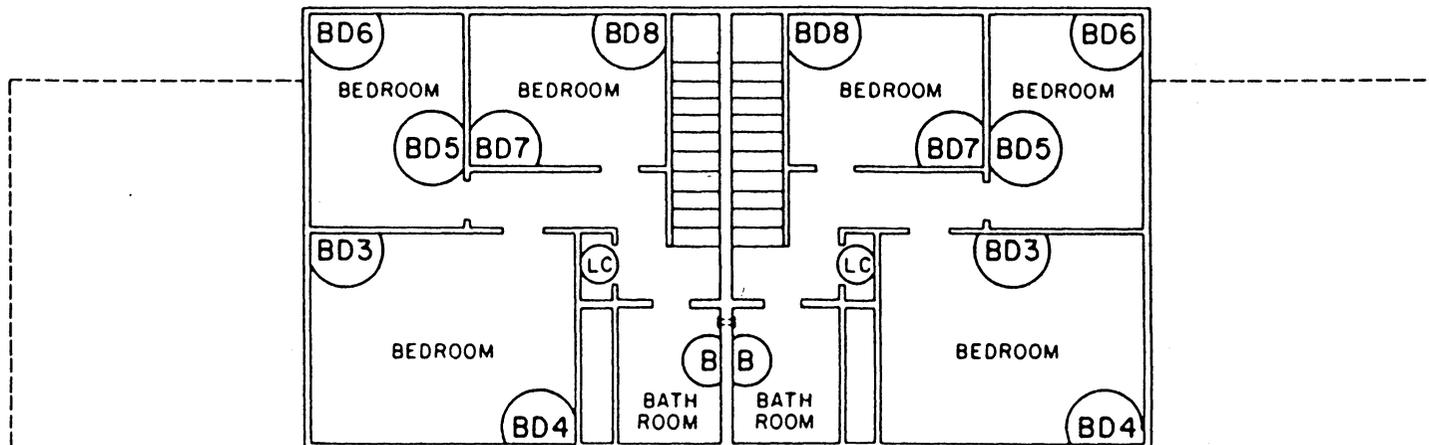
Diagram of the second floor of Building Two showing trap locations and plumbing between apartments.
